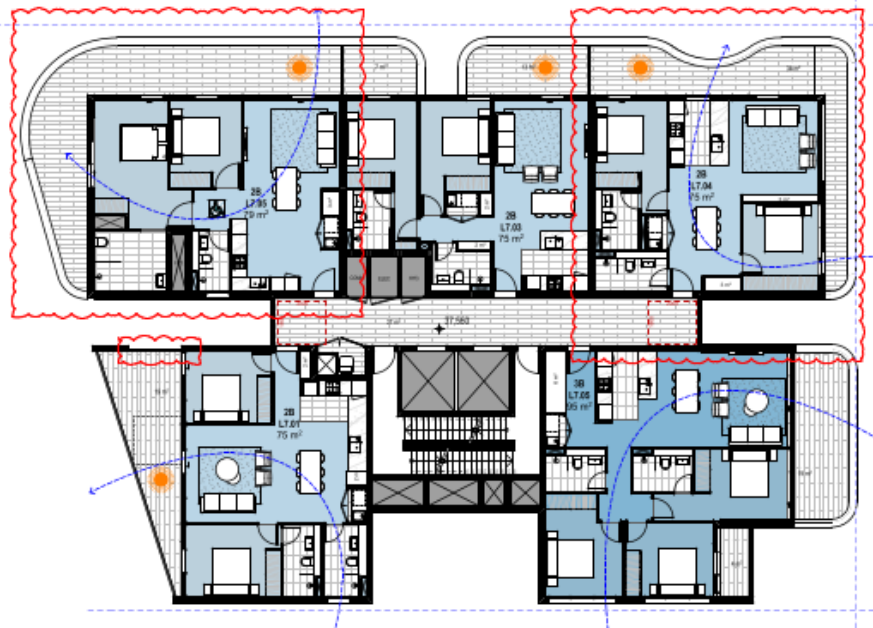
Extract of the approved floor plan of Levels 5-10 in DA2016/170/2.
